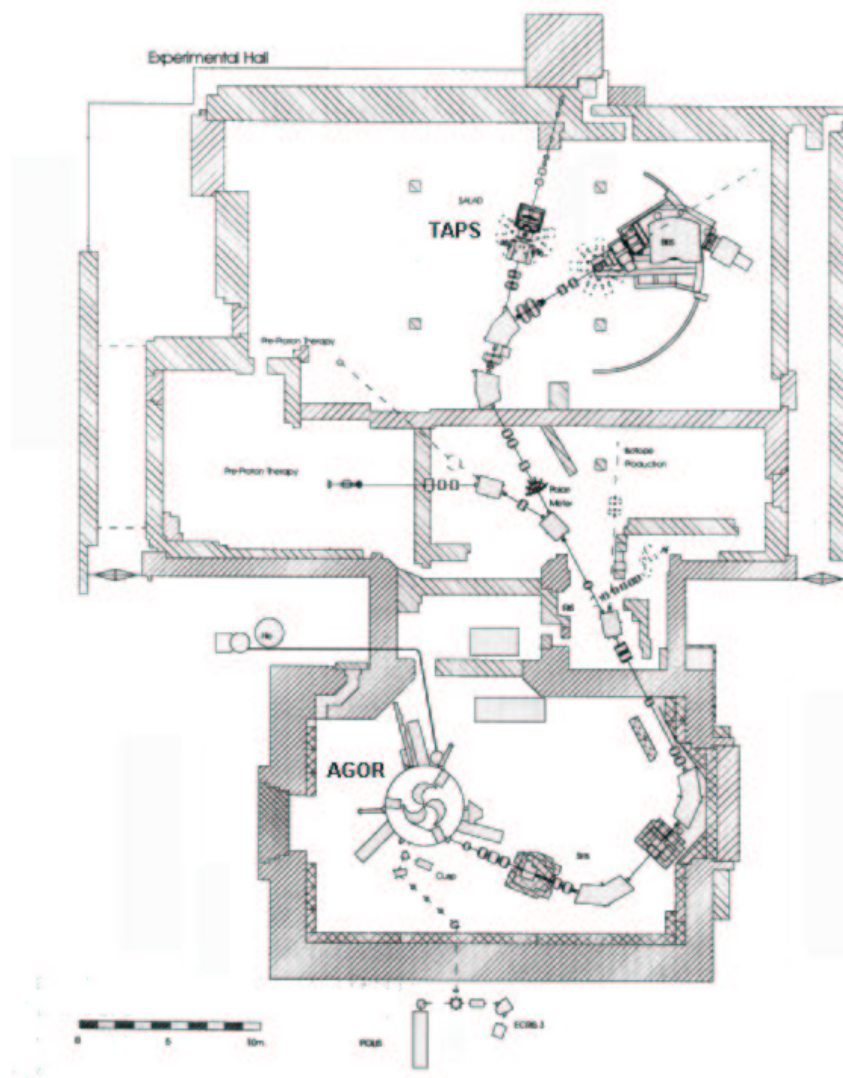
Floor plan of the KVI facility at Groningen, The Netherlands.
